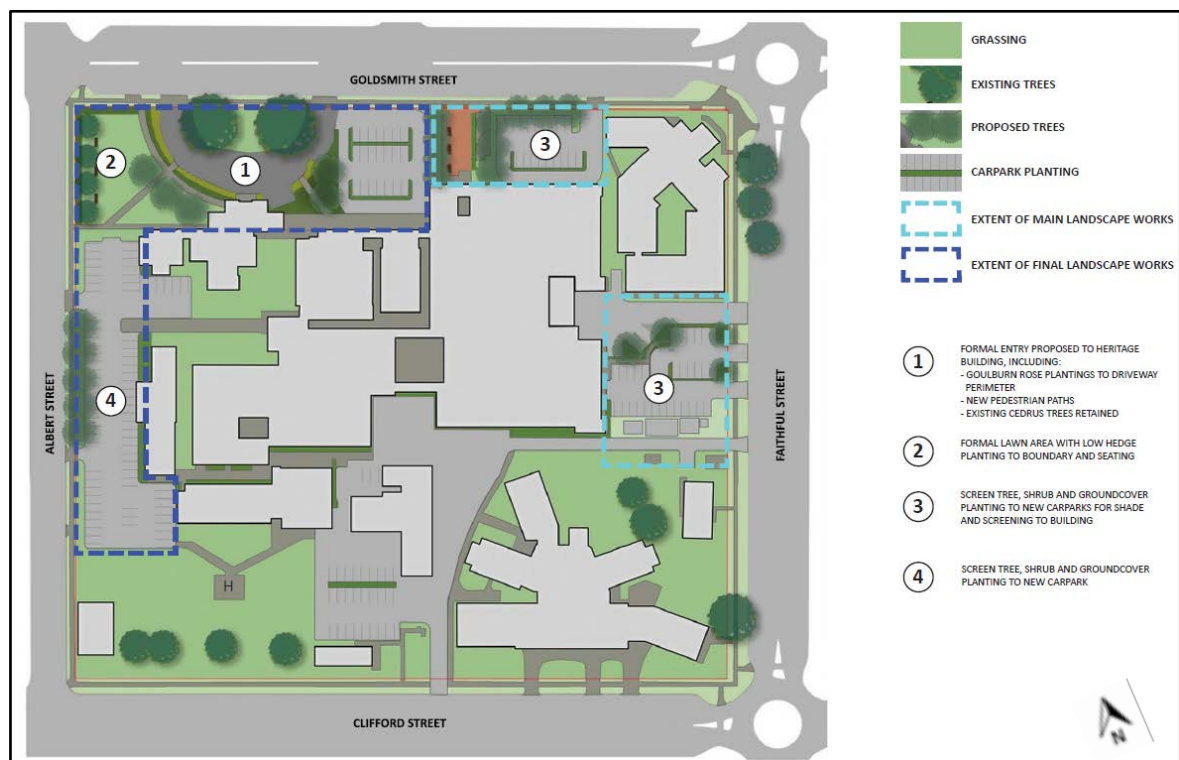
| Approved landscaping plan (Source: Modification 2 Application)
